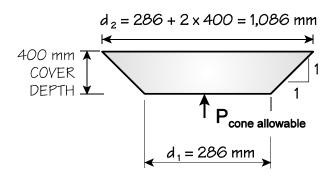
17. Pile Top to Abutment Footing Connection Detail.
